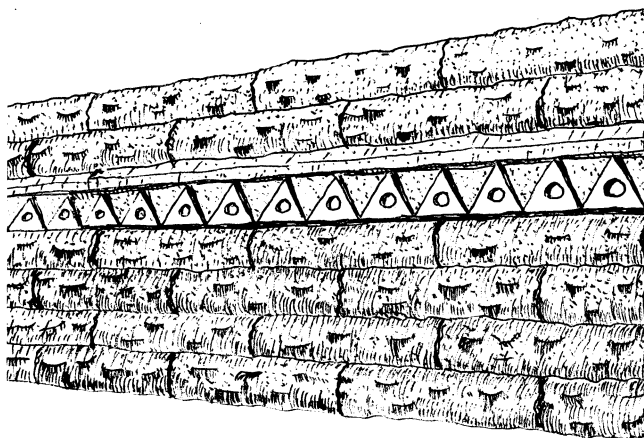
Detail, north wall, St. James Evangelical Lutheran Church (9).
